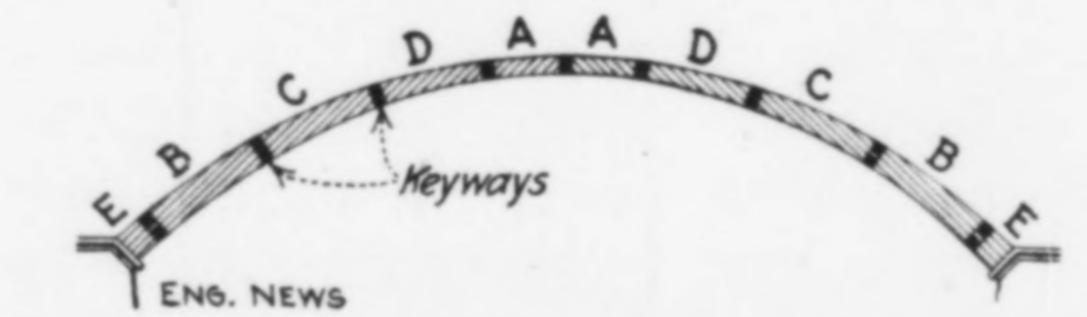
LARIMER AVE. ARCH: SKETCH SHOWING ORDER OF CONCRETING SECTIONS OF ARCH RIBS
